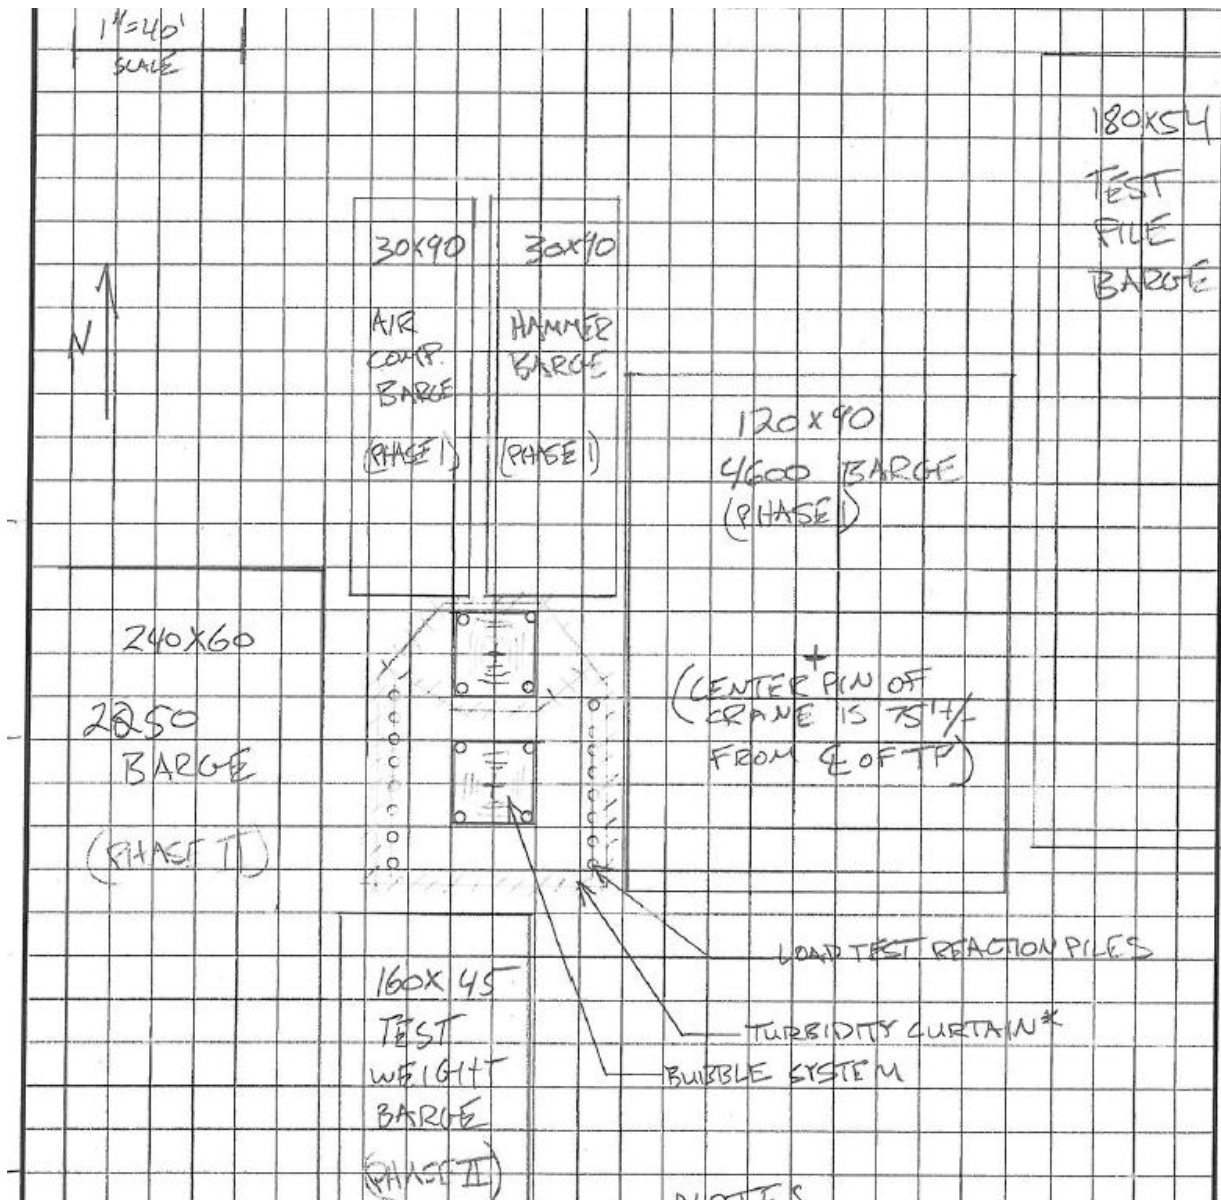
Planned barge arrangement around Test Piles 3A and 3B.
